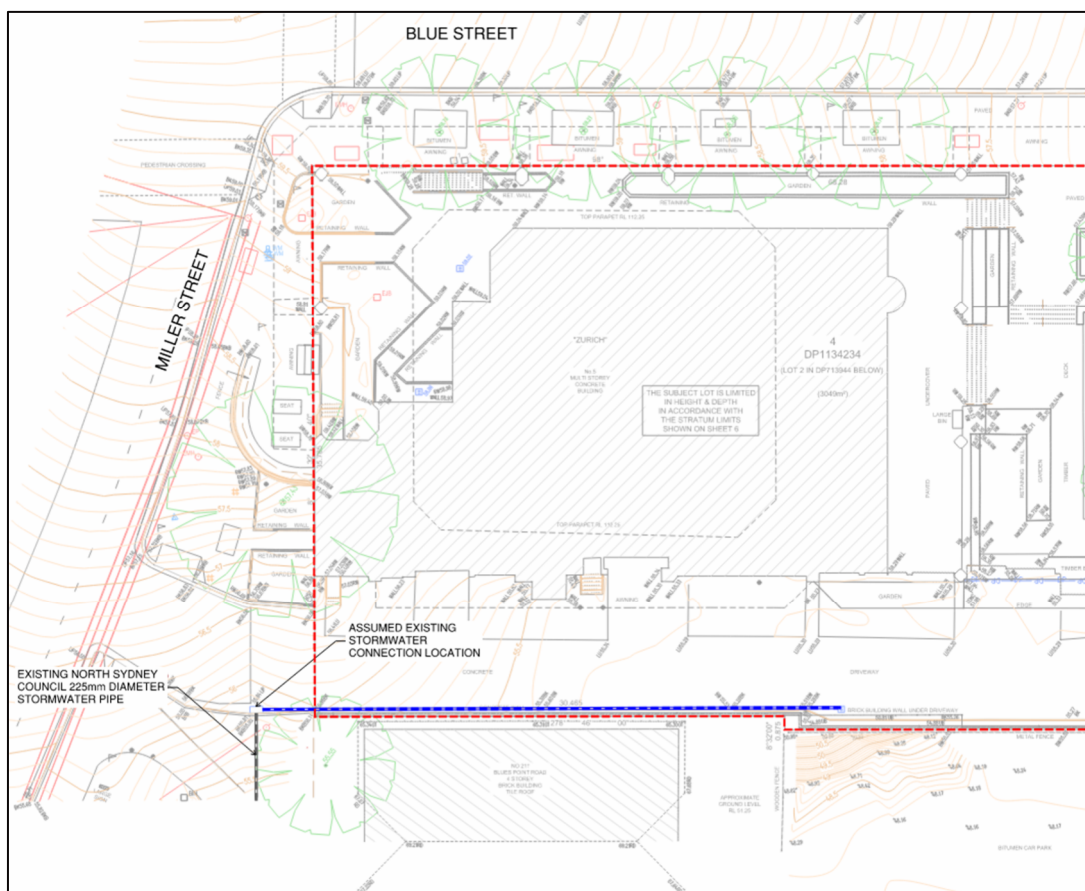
Assumed stormwater discharge location on proposed ground floor plan
